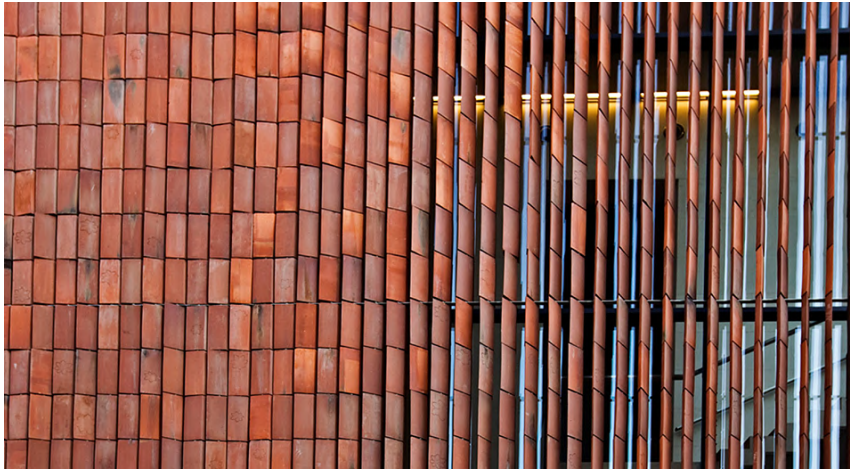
Rotating tiles of the Wyspiański Pavilion (source: <http://www.iea.com.pl/projekt.php?lang=2&pro=22>).
